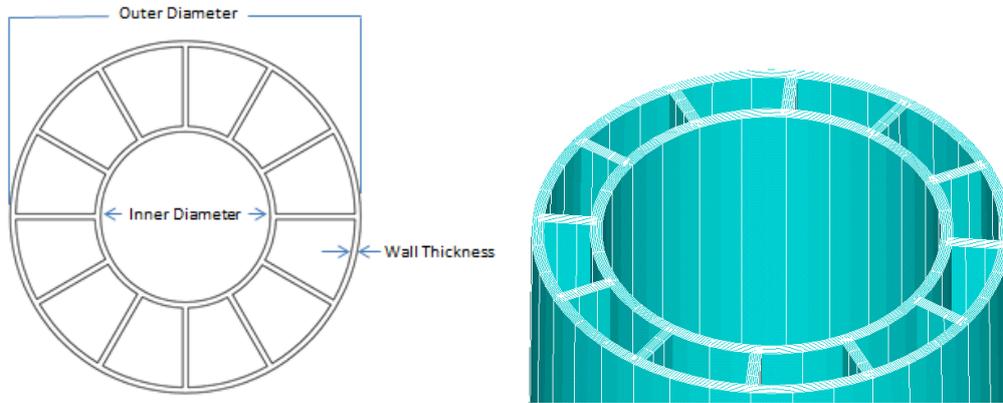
(a) Typical 12-cell tower section (b) Isometric view of a 12-cell FEA model section at the top of the tower
